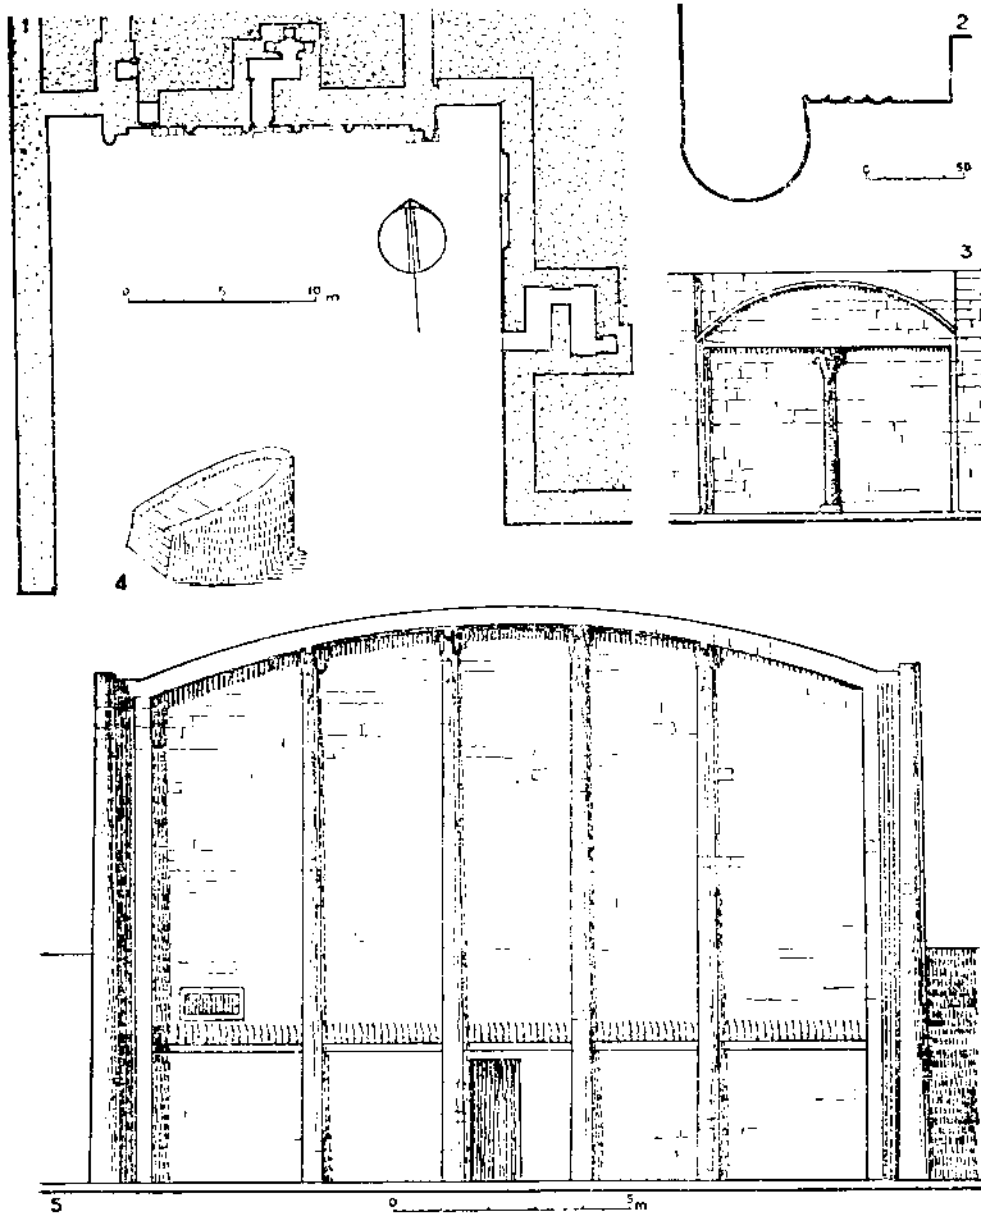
The "South Palace" in Djoser's complex: plan (1), detailed section of corner-pilaster (2), restored elevation of the dummy façade symbolizing the South (3), perspective of milestone platform in court (4) and restored elevation of the "South Palace" (5).
